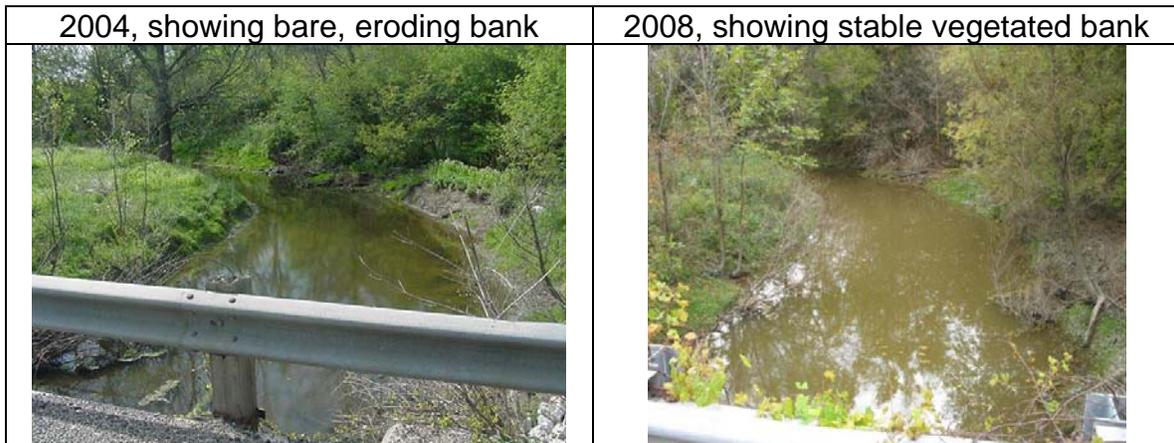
43rd Street north of 144th Avenue, after culvert replacement and rip rap addition.
